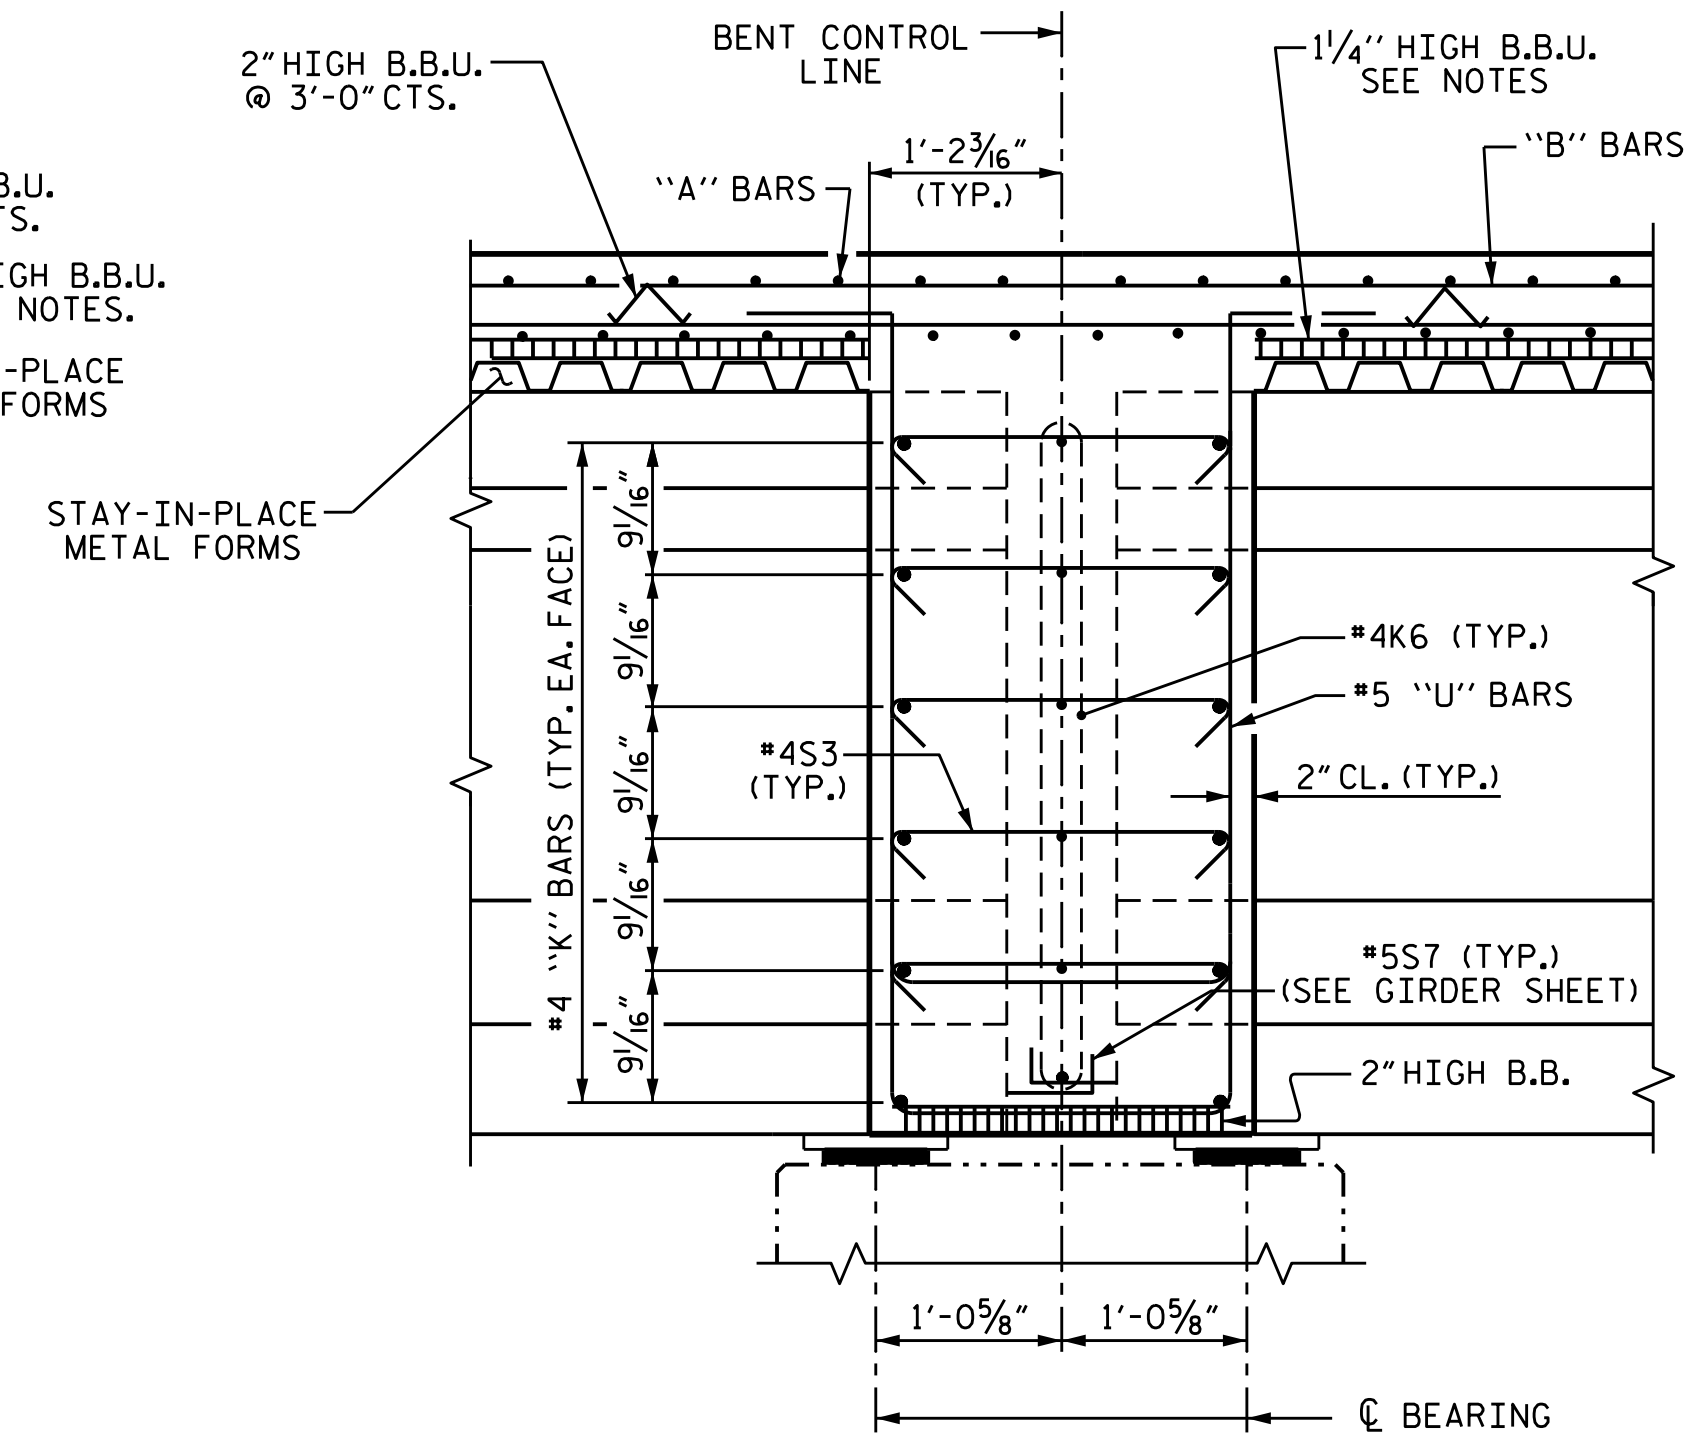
(DETAIL SHOWING "B" BARS IN REBUILD AREA) (SEE "PARTIAL PLAN OF SPAN A" FOR ADDITIONAL DETAILS)
